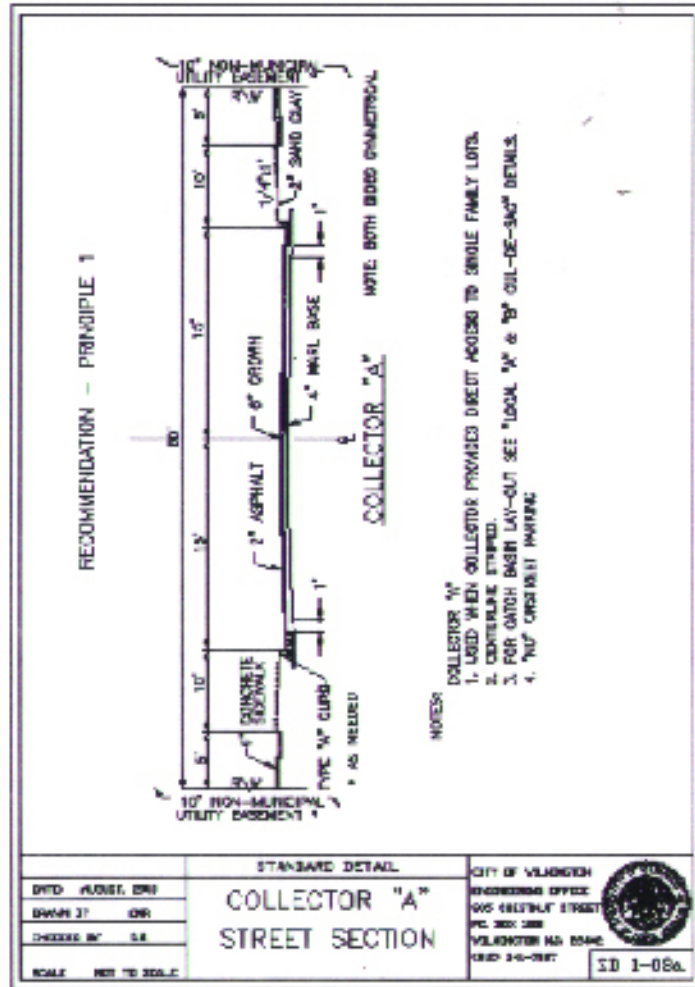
Wrightsville Avenue Street Redevelopment
